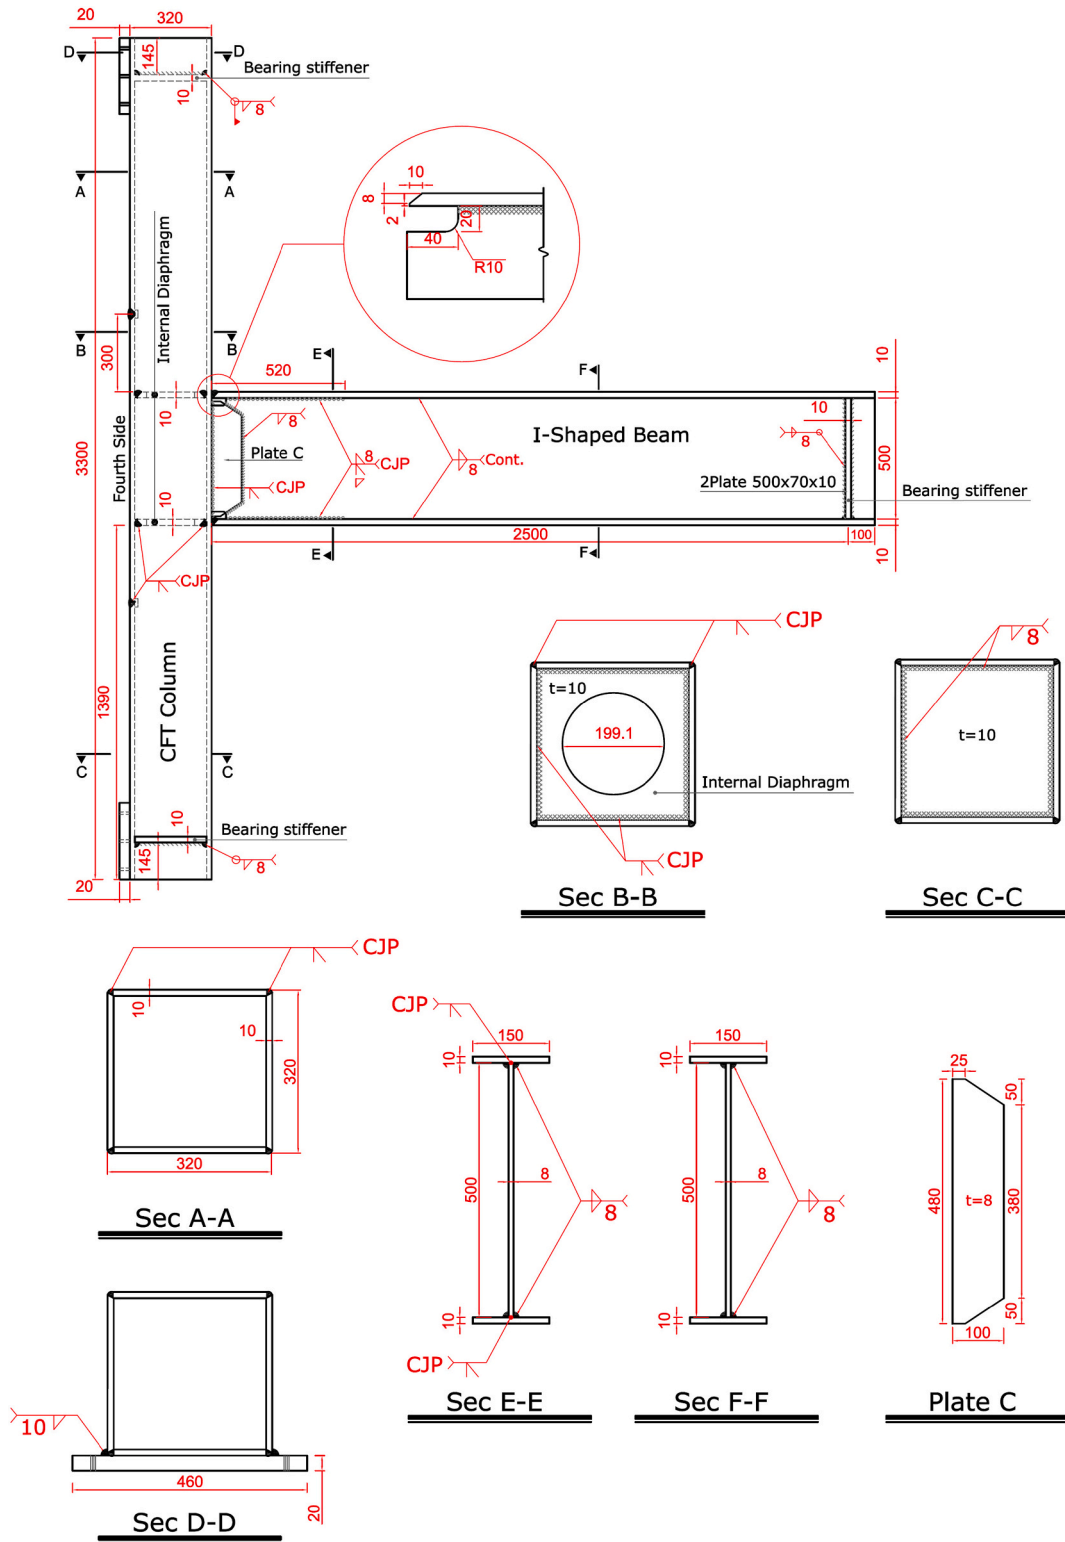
The detailed drawing of specimen 1 (ID). (Unit: mm).
